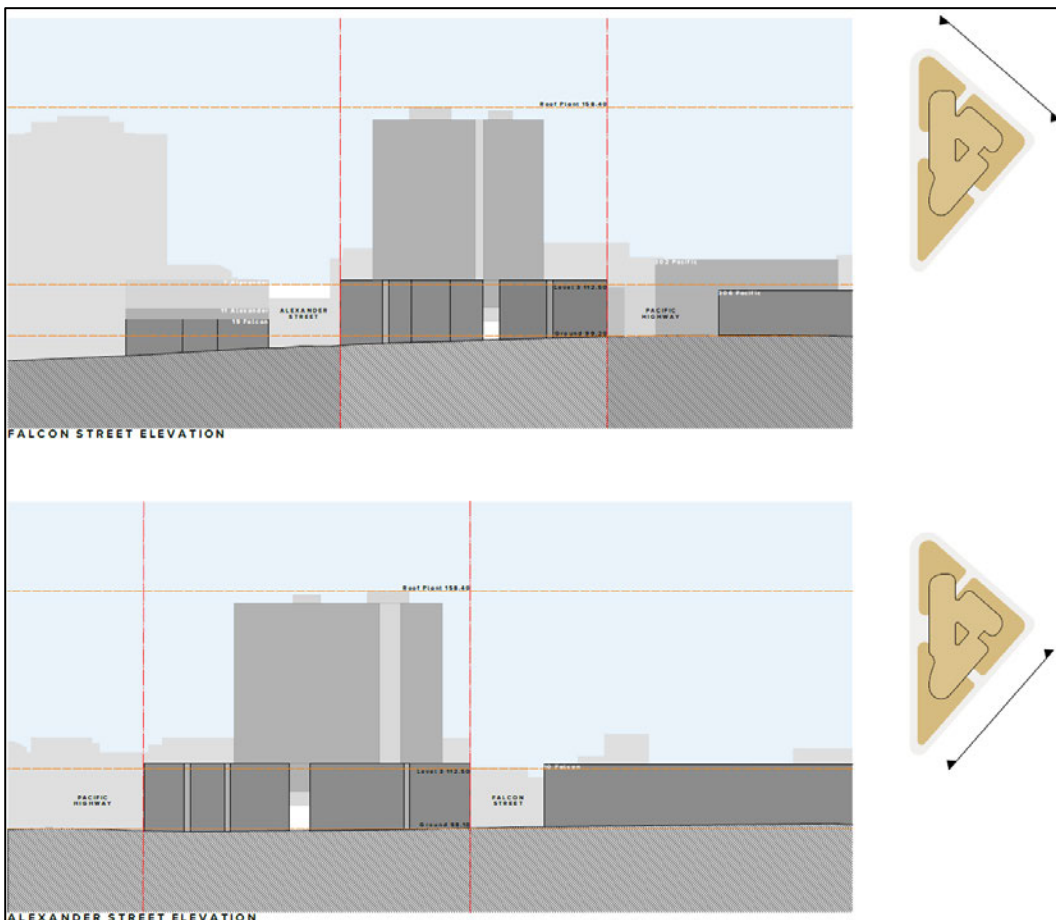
Elevations of Falcon Street and Alexander Street (source: Turner)
